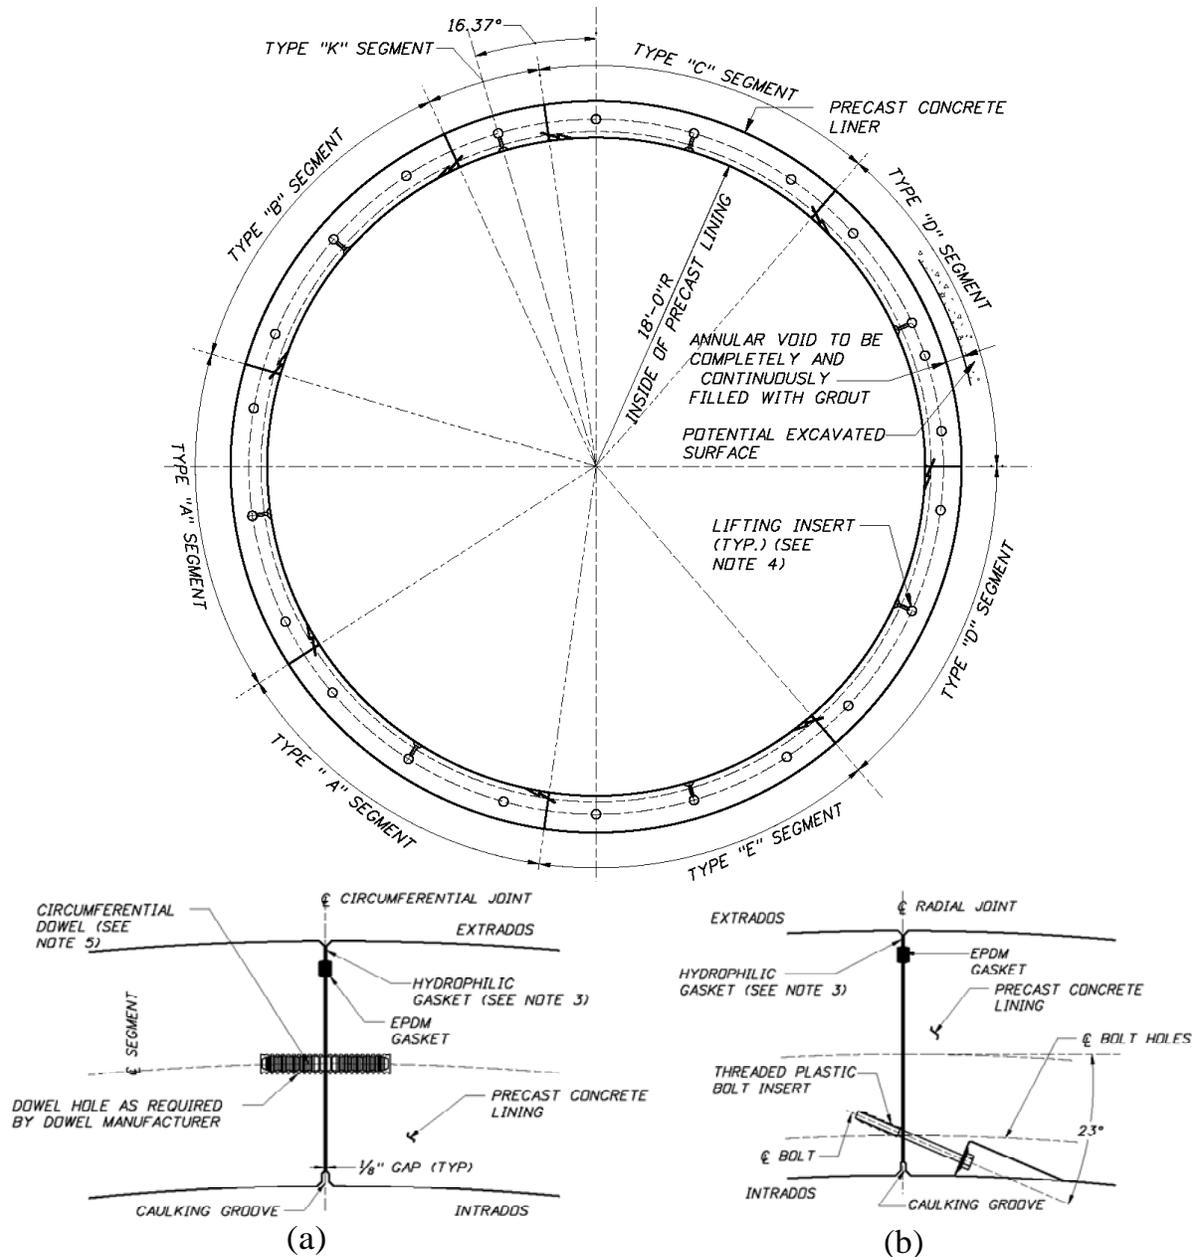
A Typical Seven Segment and a Key Segment Precast Segment Lining: (a) Circumferential Dowel; (b) Radial Bolt
